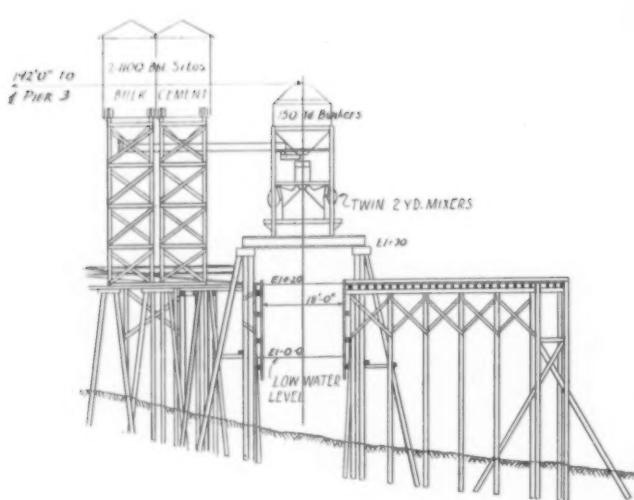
Contractor's Layout of Concrete Mixing and Proportioning Plant. Bulk Cement Barges Are Tied Up on the Shore-side of the Dock While Sand and Gravel Supply Barges Are Tied on the Channel Side. A Crane, Not Shown in the Sketch, Transfers the Aggregates From the Barges to the Storage Bin.
